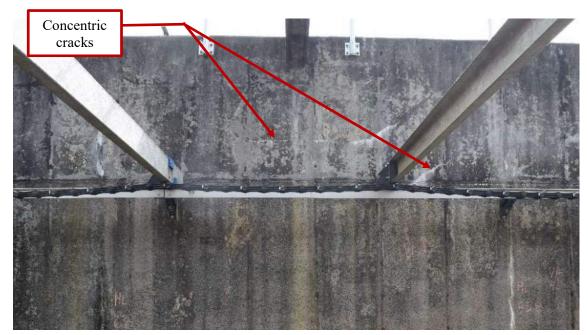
South Wall of Basin No. 2 at East Bracing Strut – (Looking South)
